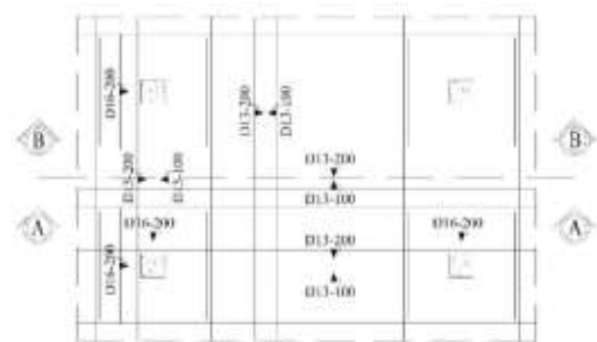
Reinforcement Plan of Flat Slab and Drop Panel on 2nd floor
